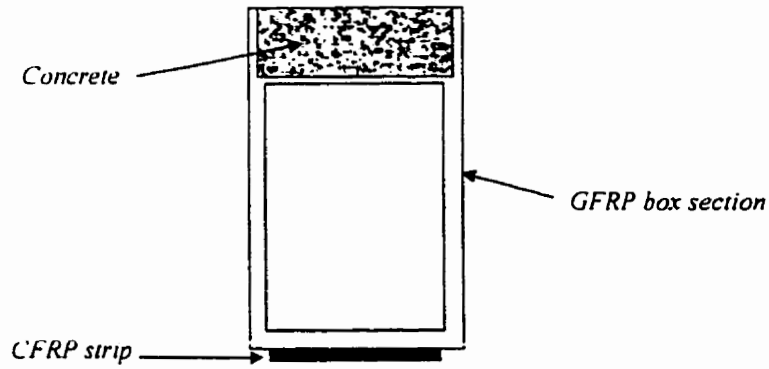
Hybrid concrete/GFRP/CFRP rectangular section [Triantafillou and Meier 1992]
